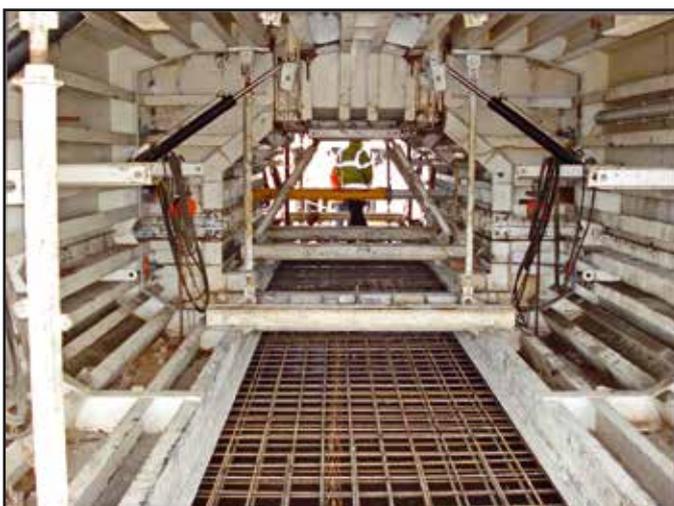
Clackmannanshire Bridge - internal steel formwork.
